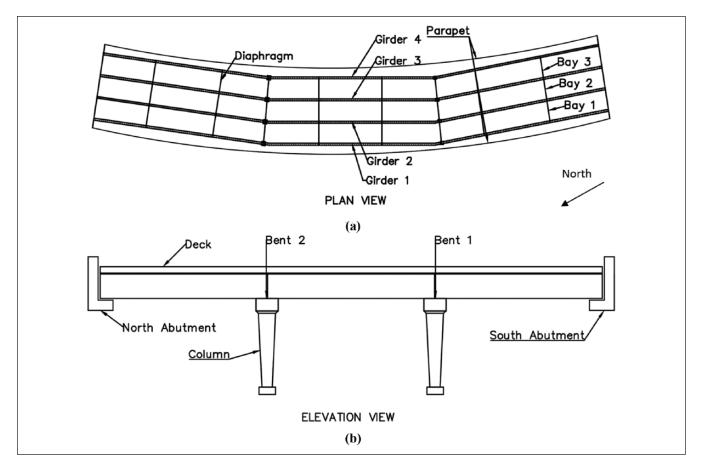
Bridge overview and component marks: (a) component marking on plan view and (b) component marking on elevation view.
